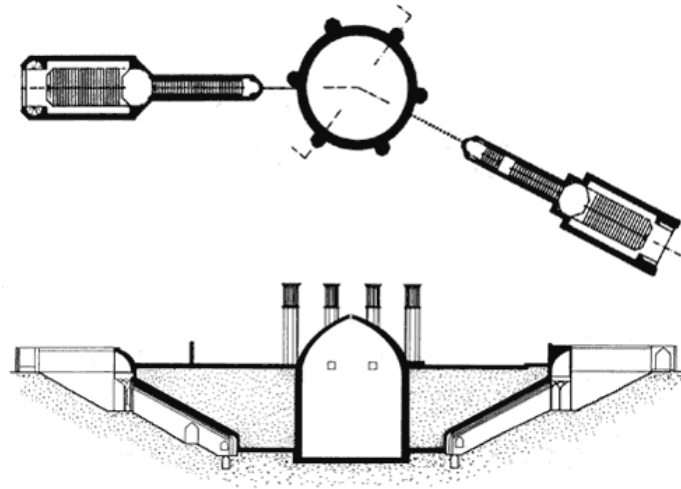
Section and plan view of an Ab-anbar in Yazd with 6 windcatchers (Source: (Ghoolabad 2010))
